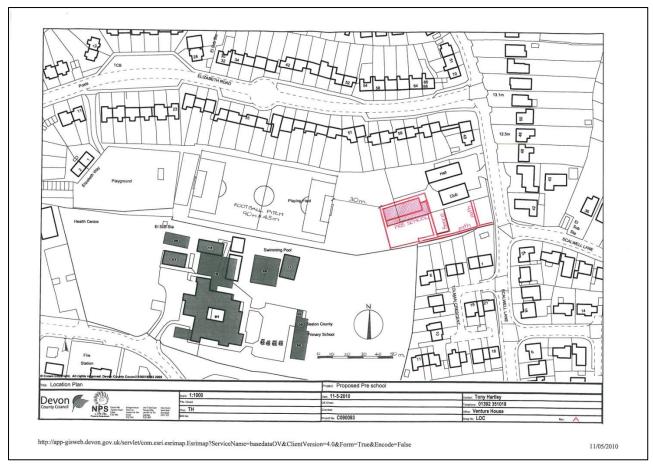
Location plan showing positions of existing huts, and proposed pre-school and grounds.
